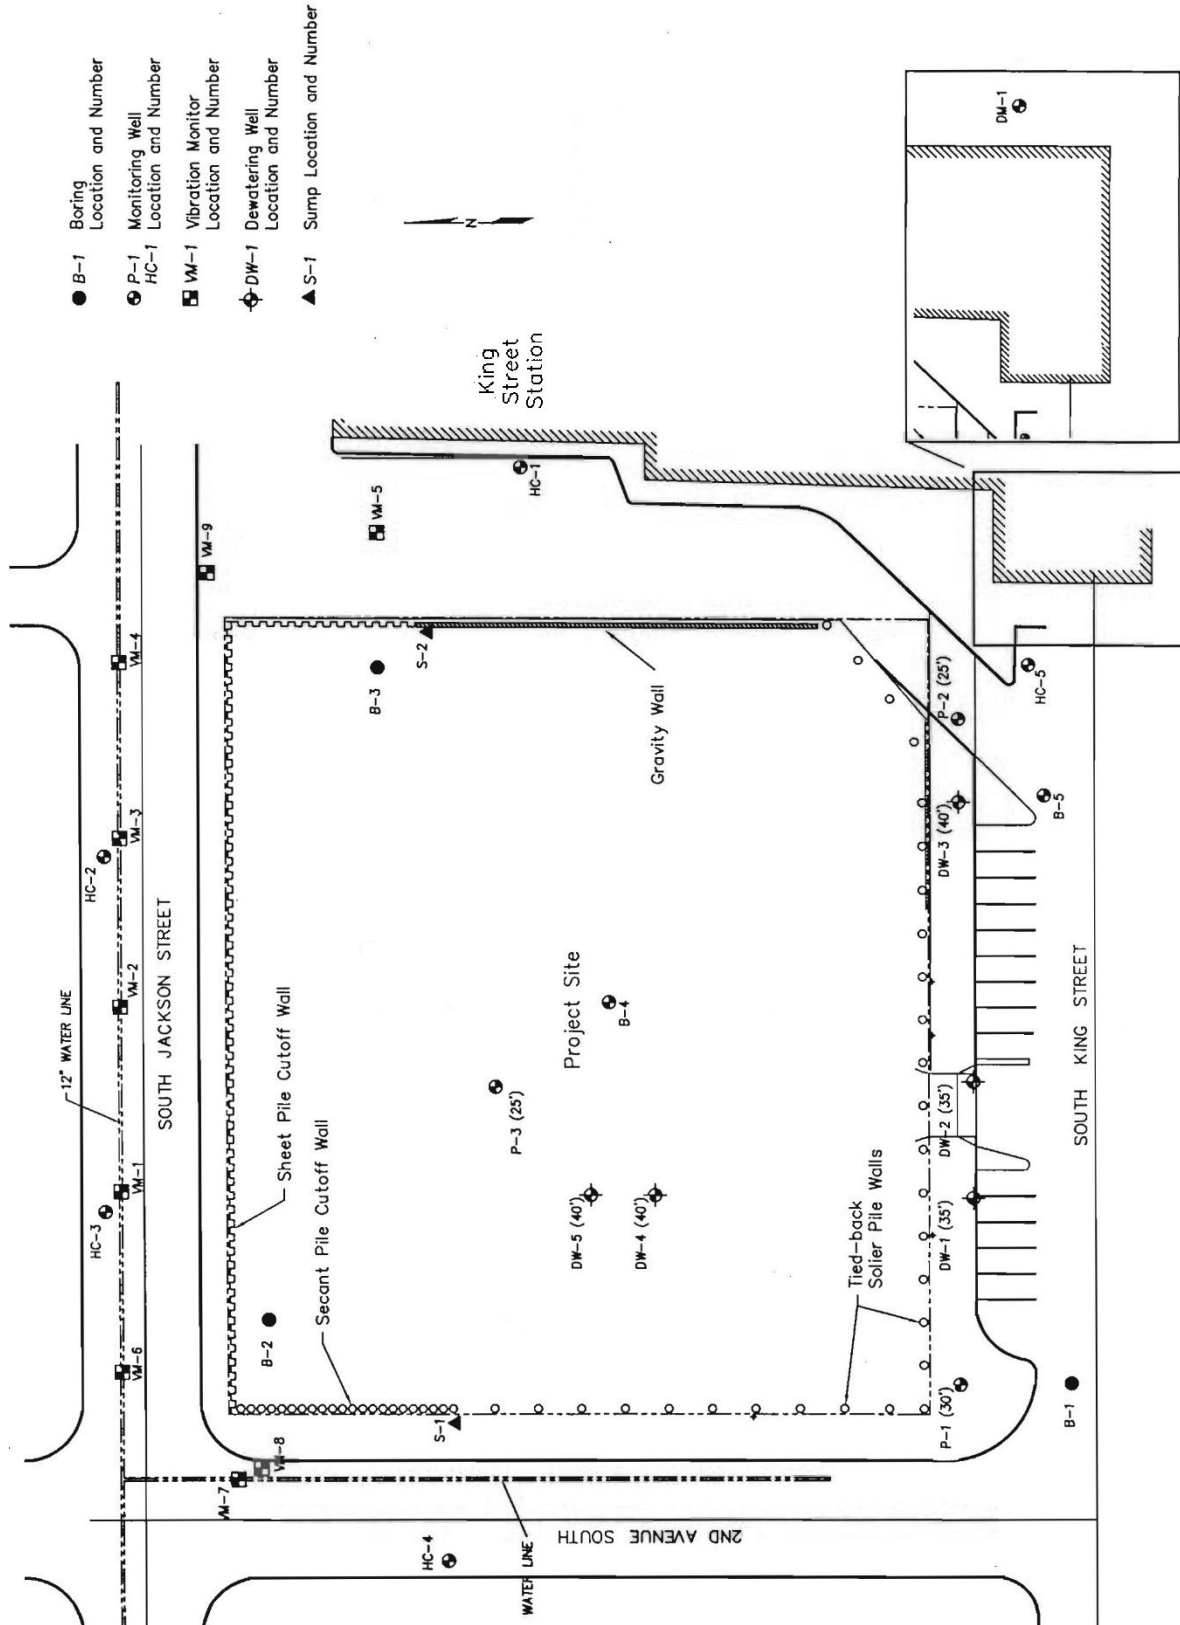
Site Plan (approximate distance between boring B-2 to B-3 is 60 m).
